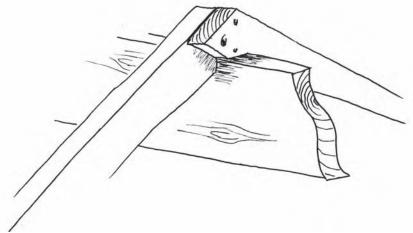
Installation of a pair of rafters onto a load bearing ridge
